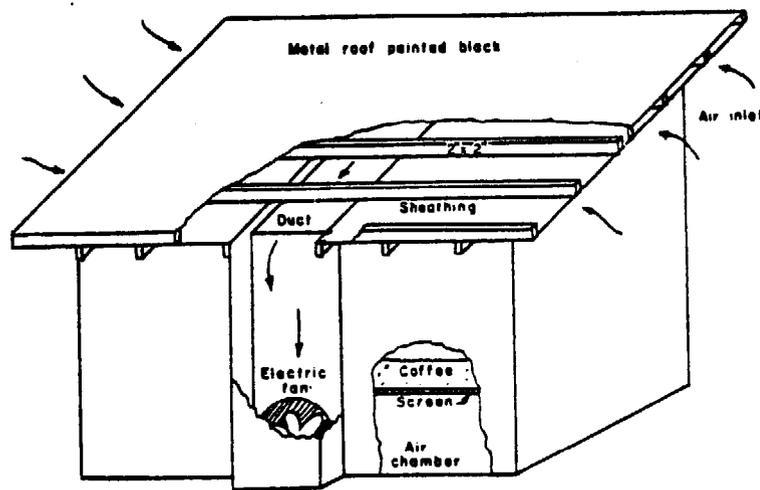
A Diagram Showing How the Roof of a Coffee-Processing Building can be Used as a Solar Heat Collector as well as a Section View Through the Drying Bins Located in the Building.
